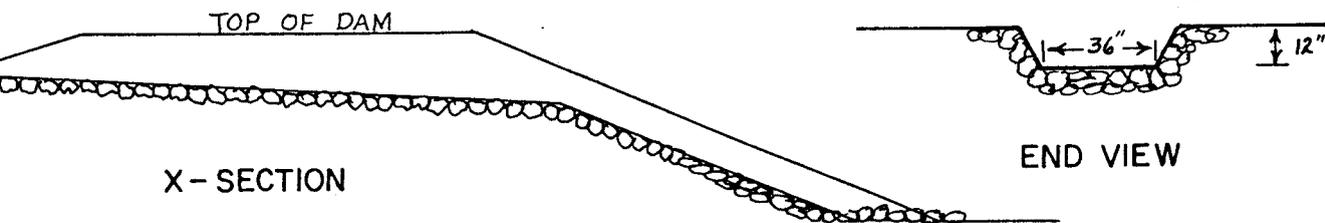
November 22, 1978 Mining Plans and typical illustrations
